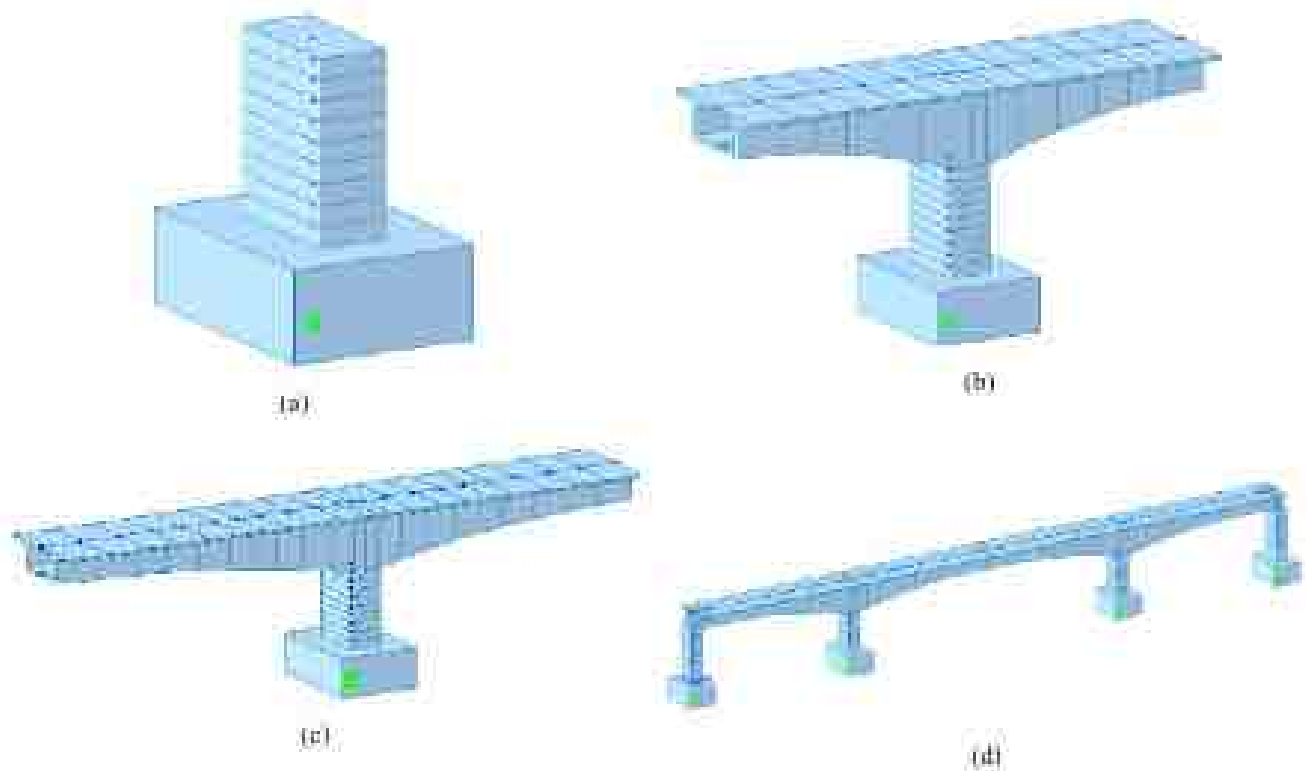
Construction Stages - (a) Sub-structure construction stage (b) Middle cantilever construction stage (c) Long cantilever construction stage (d) Bridge completion construction stage
